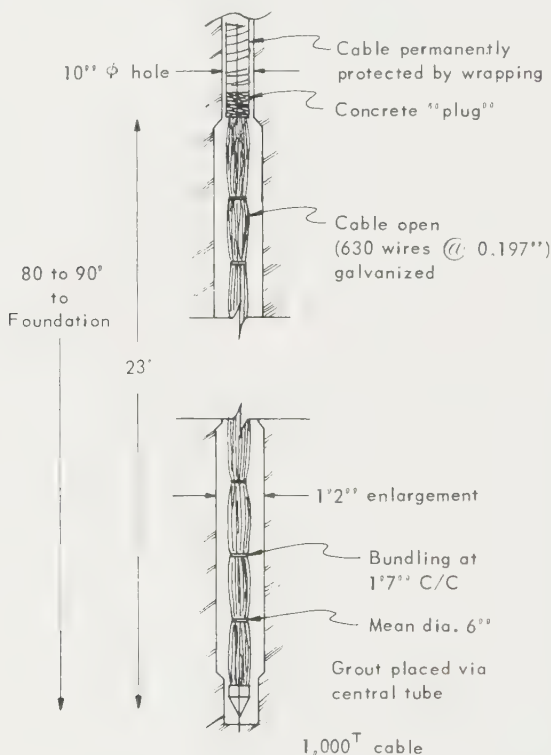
Rock anchorage. Detail of cable at Cheurfas Dam (Algeria, 1935).
